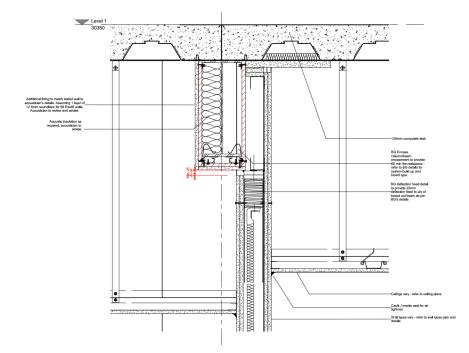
below shows typical requirement where a partition meets the underside of a steel beam:
